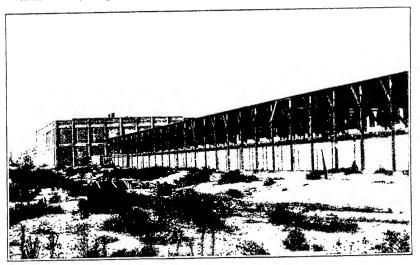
General View of Ice-Storage Building and Precooling Shed.
